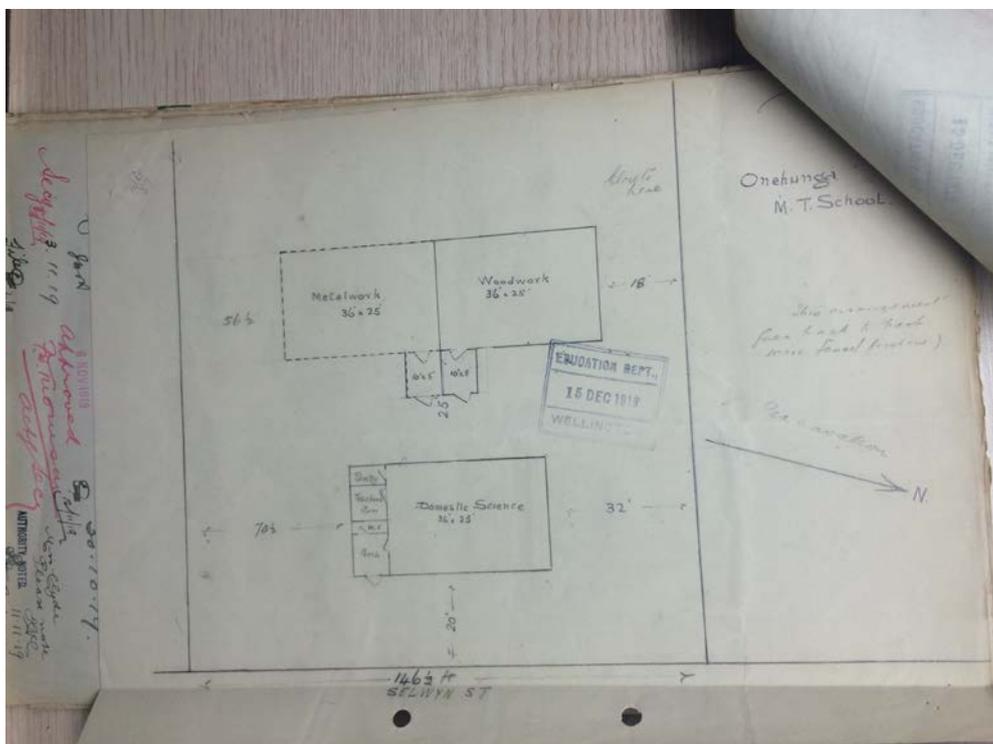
Proposed plan December 1919. Shows the two proposed buildings sitting sideways to Selwyn Street. The domestic service building closest to the street and a larger two roomed metalwork and woodwork building in behind. (Education Department. (1919-1981) Buildings and Sites - Onehunga Manual Training Centre (R22887276) at Archives New Zealand)
